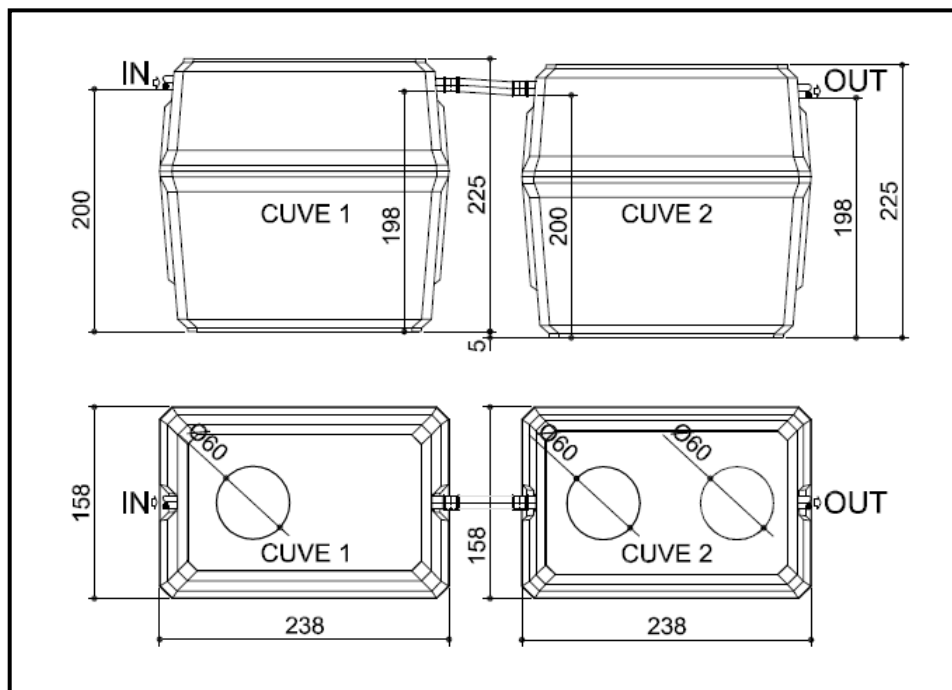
Dimensional drawing of the Oxyfix® C-90 MB 15 EP (2)
